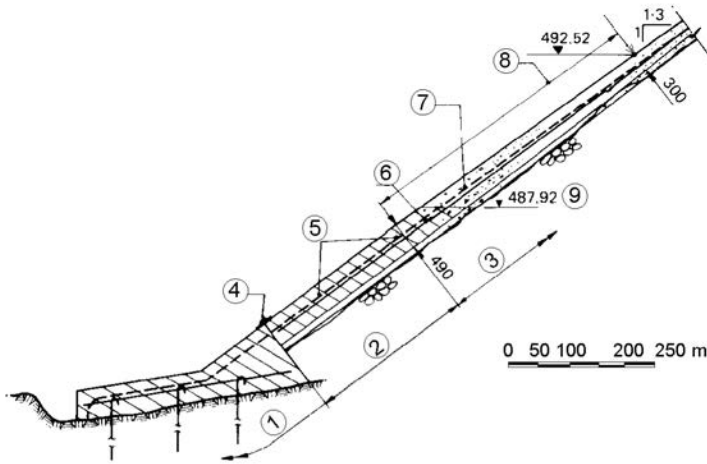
Typical section through the heightening of the facing (after Lenehan, 1992). (1) Existing foundation slabs; (2) slabs of the existing facing; (3) slabs of the new part of the facing; (4) filling of the perimeter joint; (5) existing PVC-waterstops; (6) existing reinforcement; (7) new PVC-waterstop; (8) transition zone in which there is a transition of the thickness of the facing at 30 cm, of which the thickness remains constant up to the crest; (9) existing crest.
